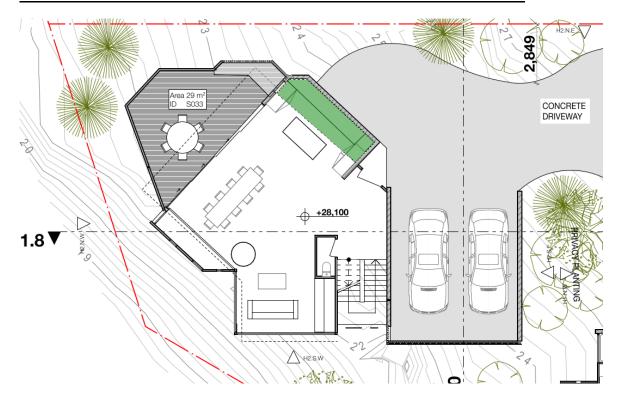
Extract from Level 2 Floor Plan - Construction Certificate plans.
